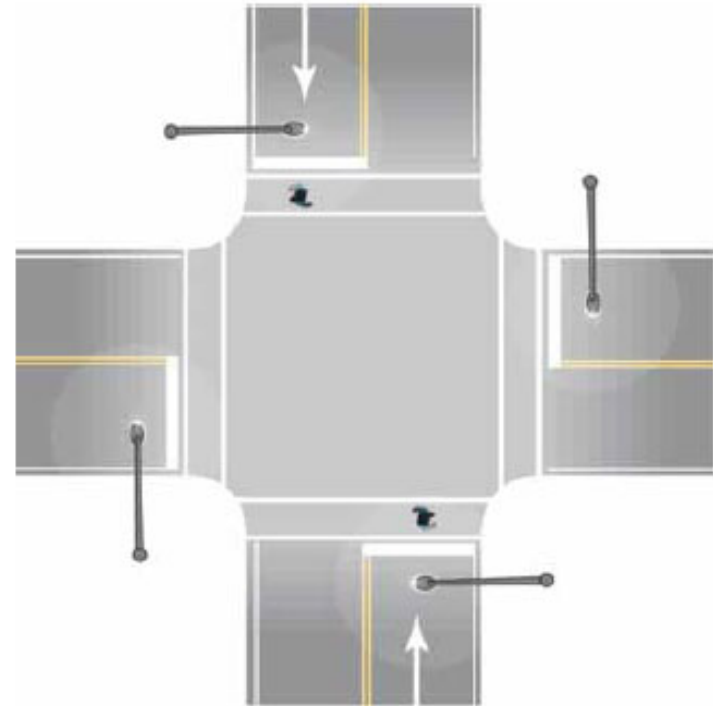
Drawing. New design for intersection lighting layout for crosswalks.
